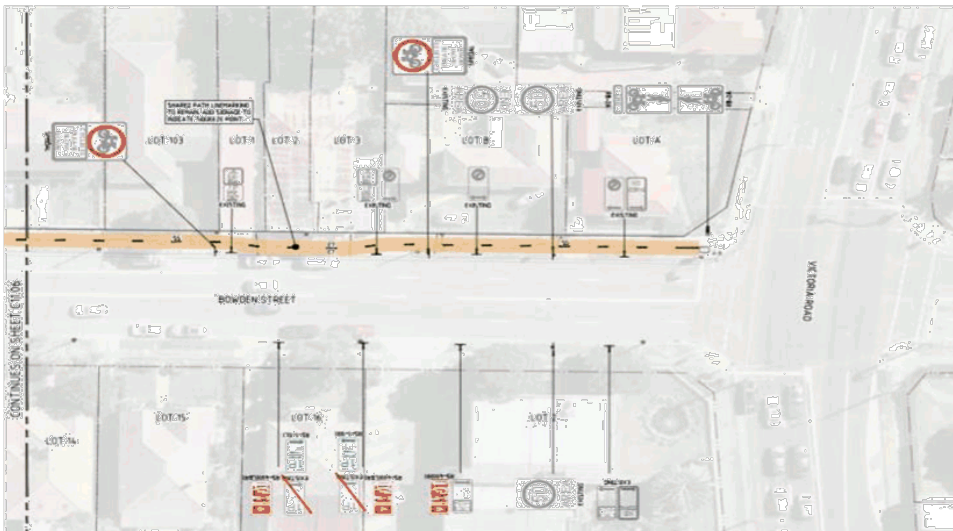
SUP on western side of Bowden Street with timed restrictions on the eastern side
